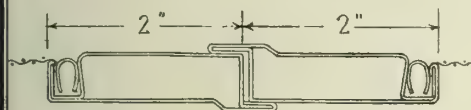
SECTION THROUGH STILE OF HEAVY METAL FRAME DOOR
